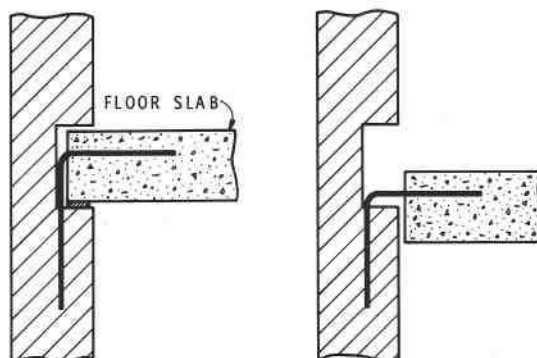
'Slack' joint resulting in beam falling off bearing seat.
